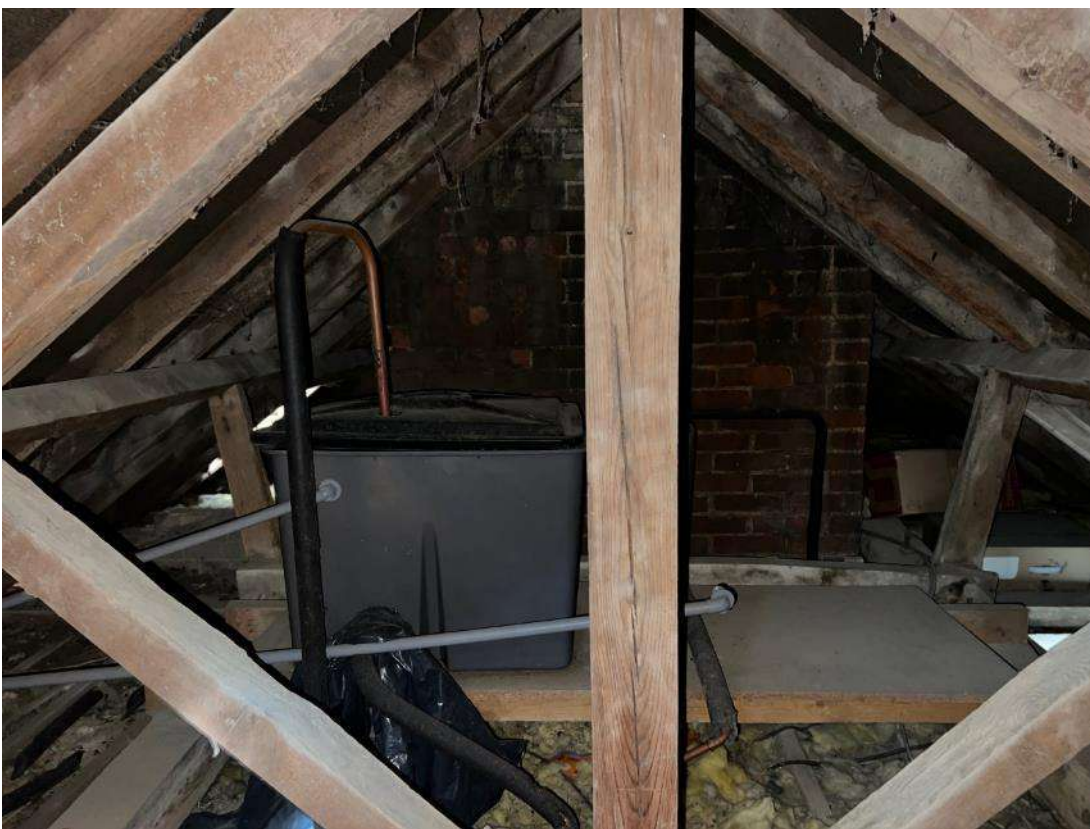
Building section 2 (ref B2A). Shows north end of roof space behind chimney stack.
